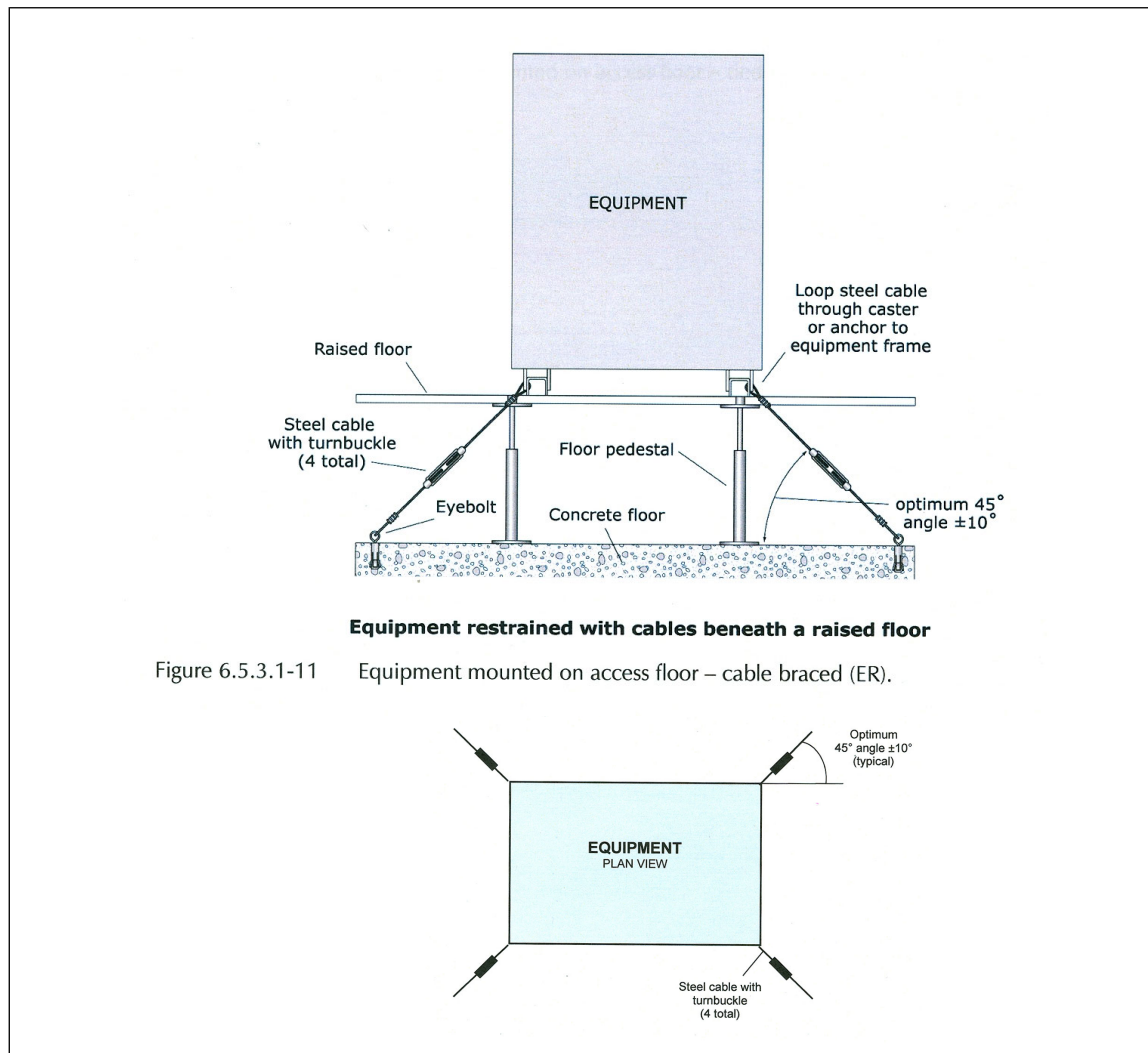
C. Example of equipment supported on raised access floor restrained with four cable tethers to the structural floor (Figure 6.5.3.1-11 from FEMA E-74 with additional plan view)
